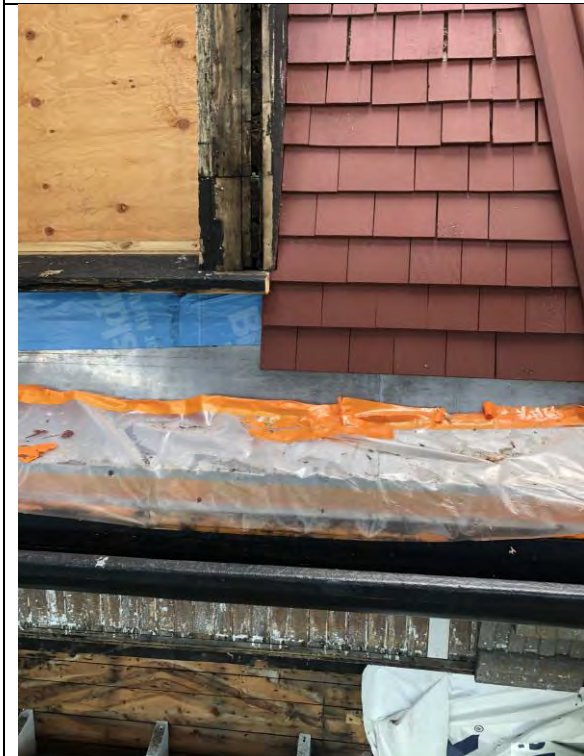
Shingles on the 3rd floor. Repairs almost completed. Note dutchmen repair at the base of window trim.
